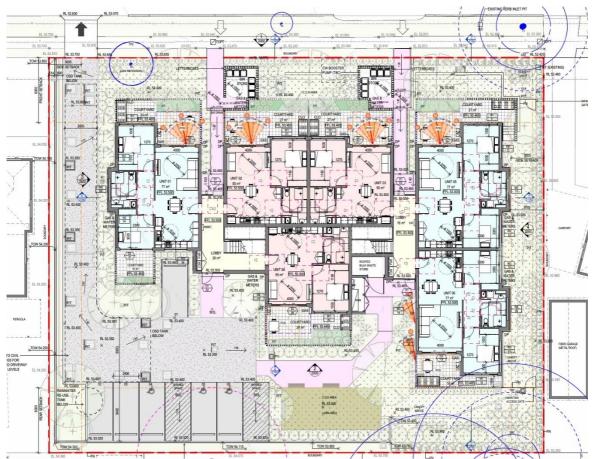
Extract from Architectural Plans – General Arrangement Plan – Ground Level (Source: Architectural Plans, Mode Design, dated 13.06.2023)
